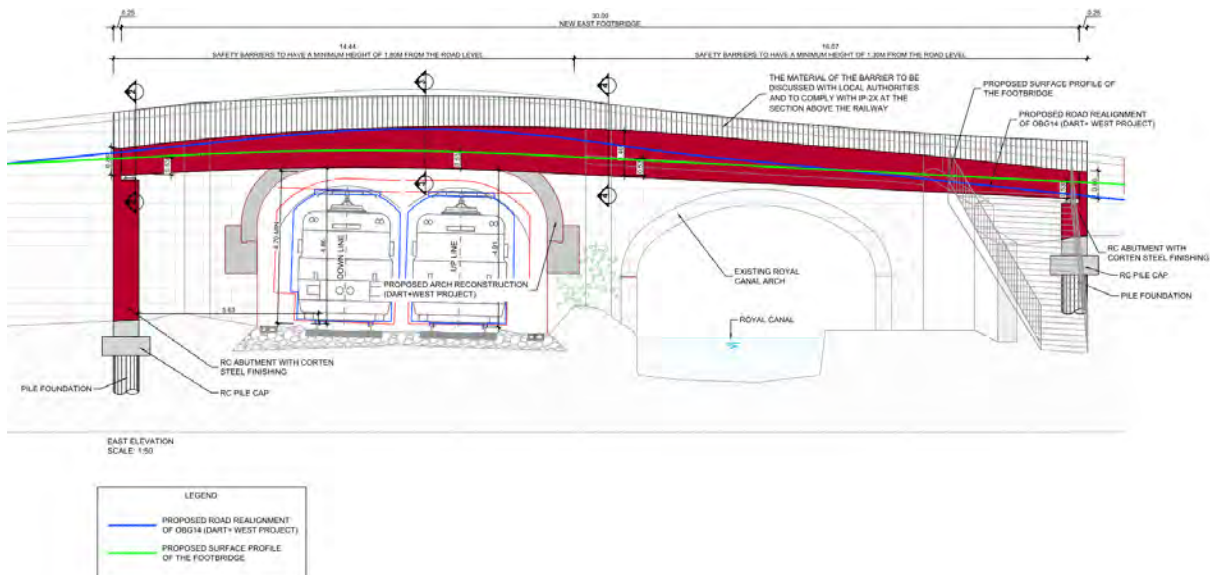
Proposed footbridge east of OBG14 - East Elevation
